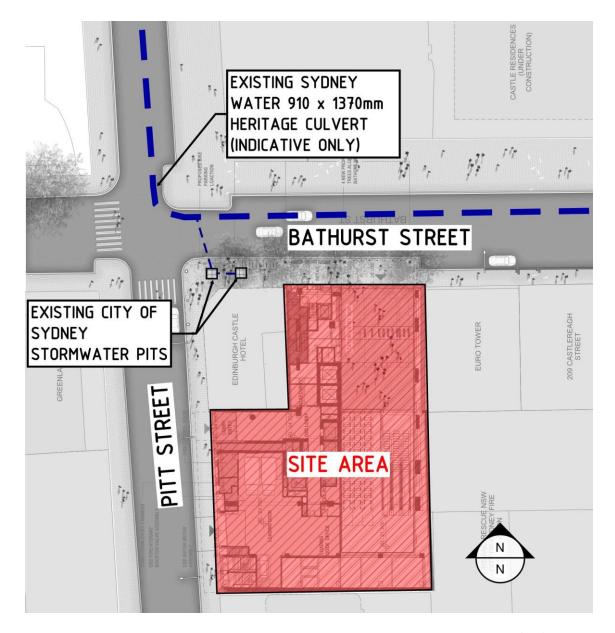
Inground Stormwater Infrastructure (adapted from DBYD plans 16/12/19)
